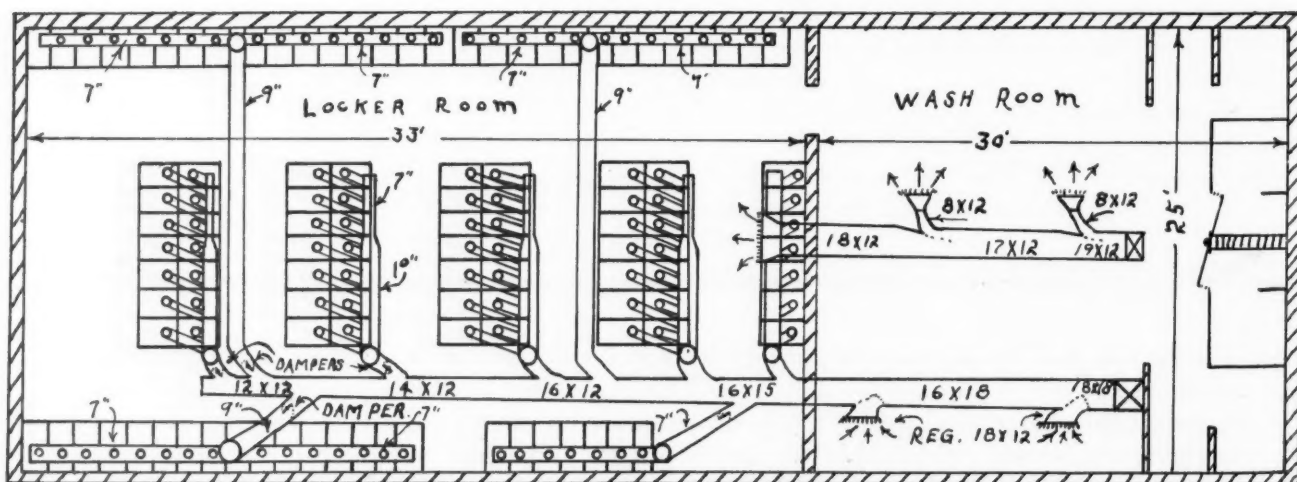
Layout of a typical locker room assembly with a mechanical ventilating system installed. Every locker is tapped into the ducts through an individual pipe. Room air is withdrawn through open faces
